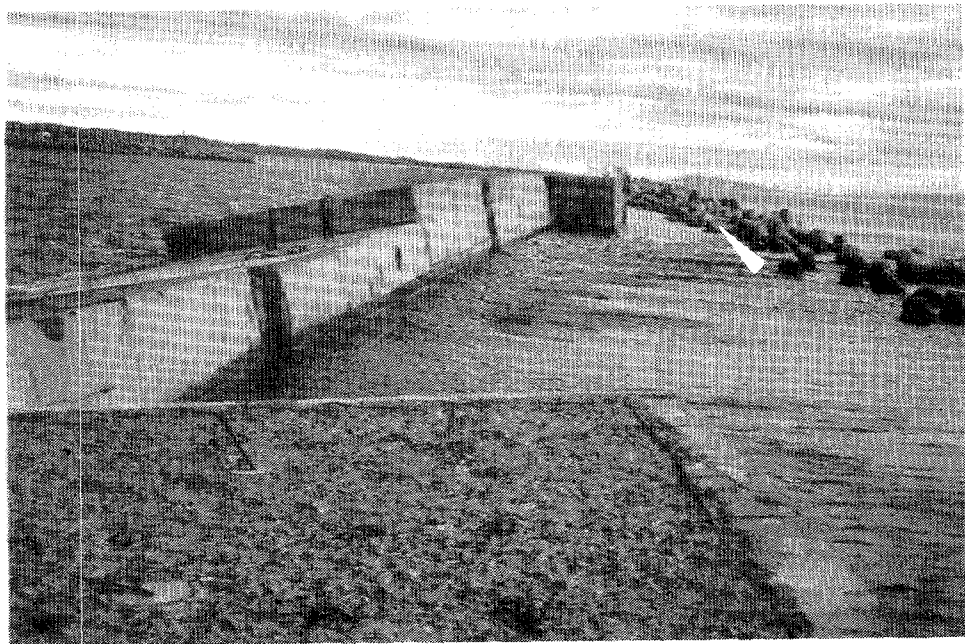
View of a Row of Translated Caissons of the Zone presided by the Toa Construction Co. Ltd. at the Noshiro Harbor.
